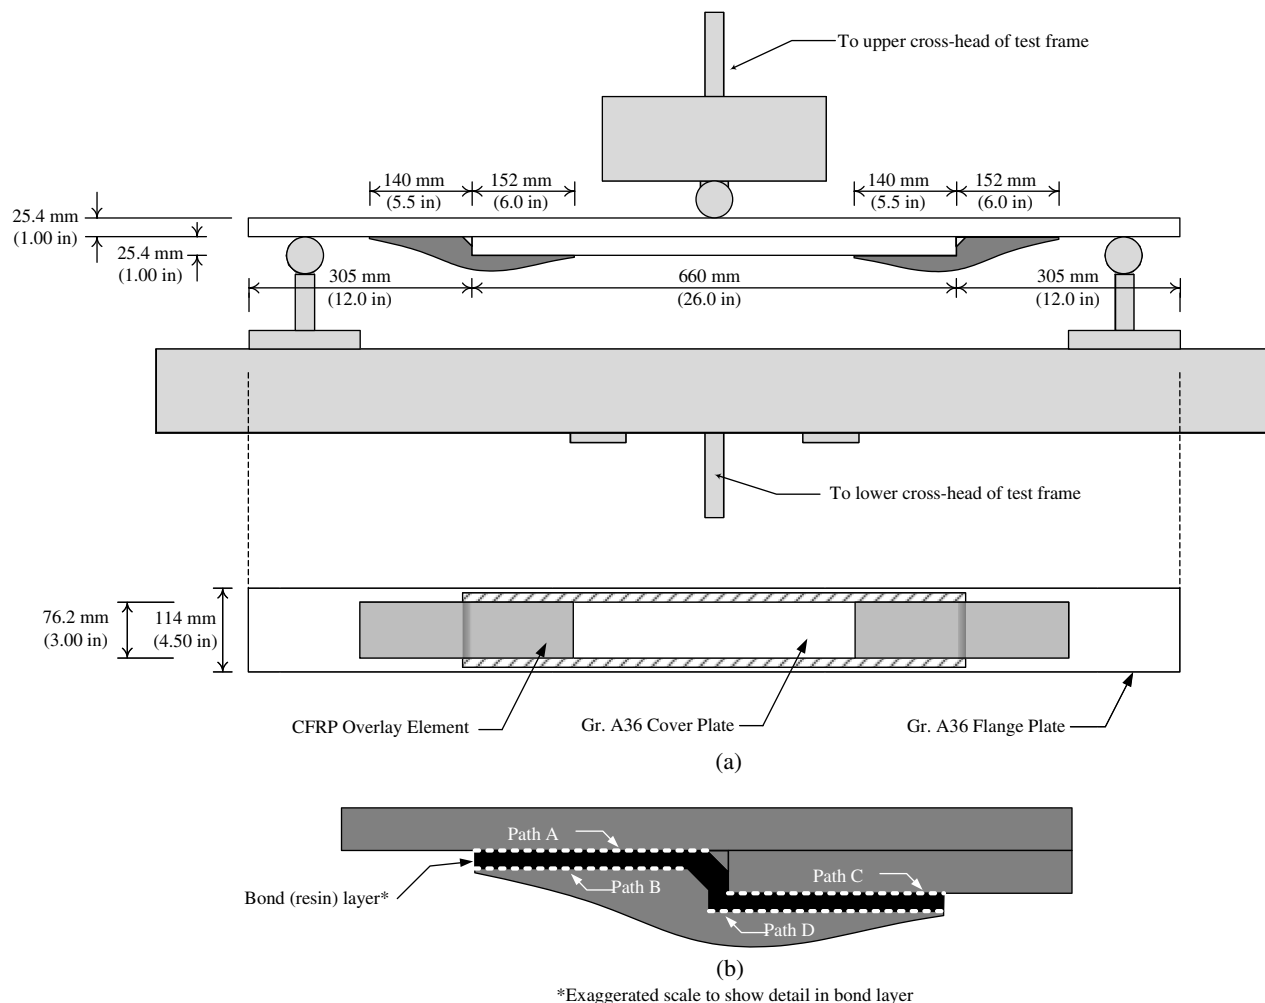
(a) Schematic of three-point bending fixture with CFRP-stiffened specimen; (b) detail of CFRP-resin-steel bond interface
